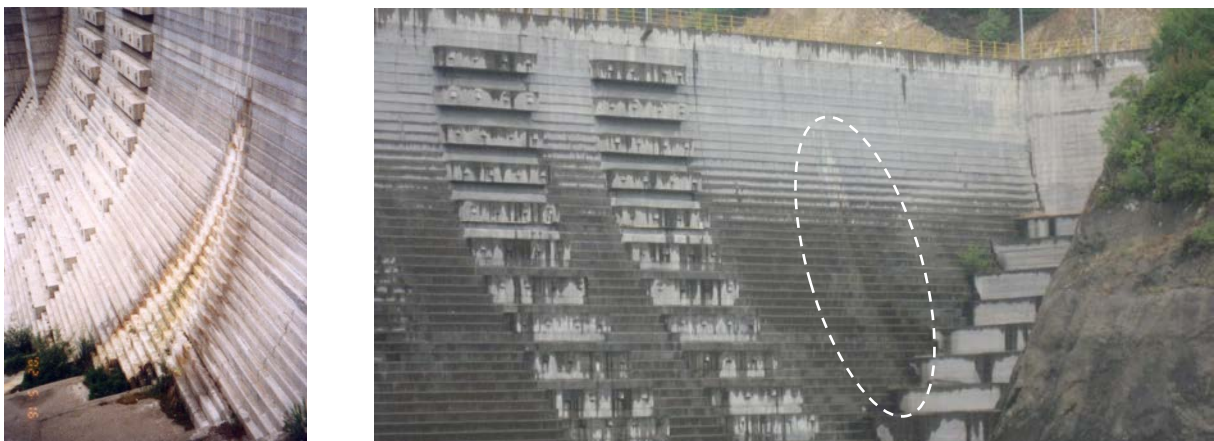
(Left) Downstream face dried up immediately after completion of the waterproofing works and (right) during an inspection in 2006.
